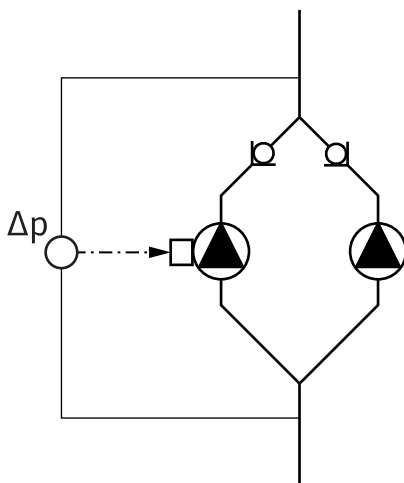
Example – differential pressure sensor connection in y-pipe installation
